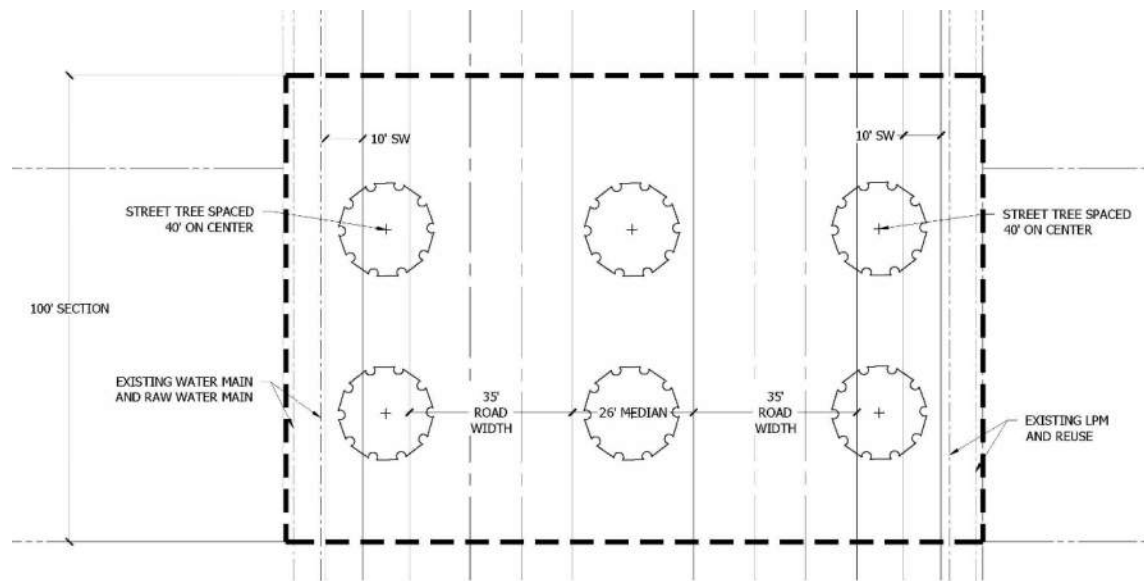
Typical 100-foot Plan View Section of 150-foot Right-Of-Way
